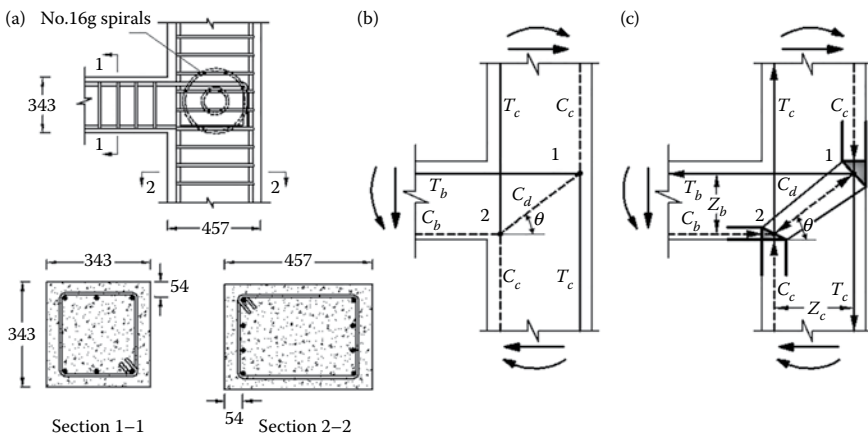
Example 7.3—an exterior beam–column connection: (a) connection, (b) *STM*, and (c) *STM* details.
